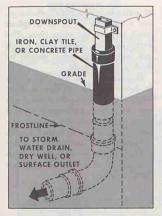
Roof water can be routed to a storm water drain or other outlet.
